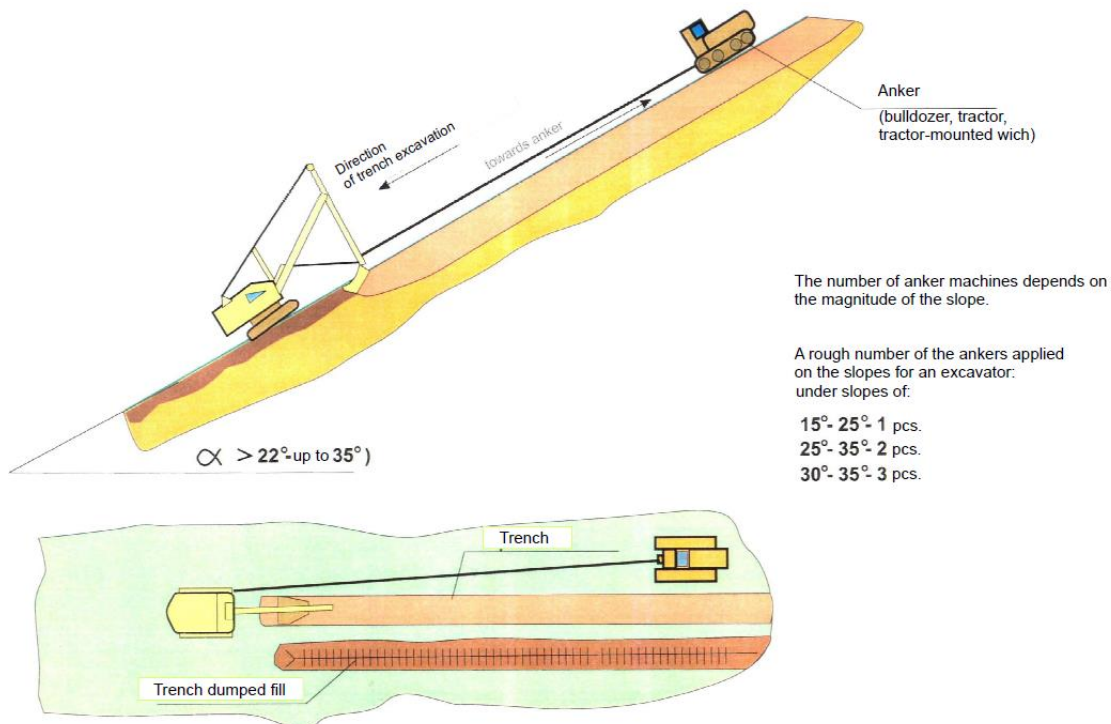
Excavation of trenches on inclines from 22 grade to 35 grade.
